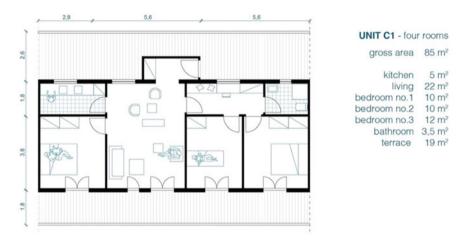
Typology 2 unit C1 plan. Source elaboration of the authors
